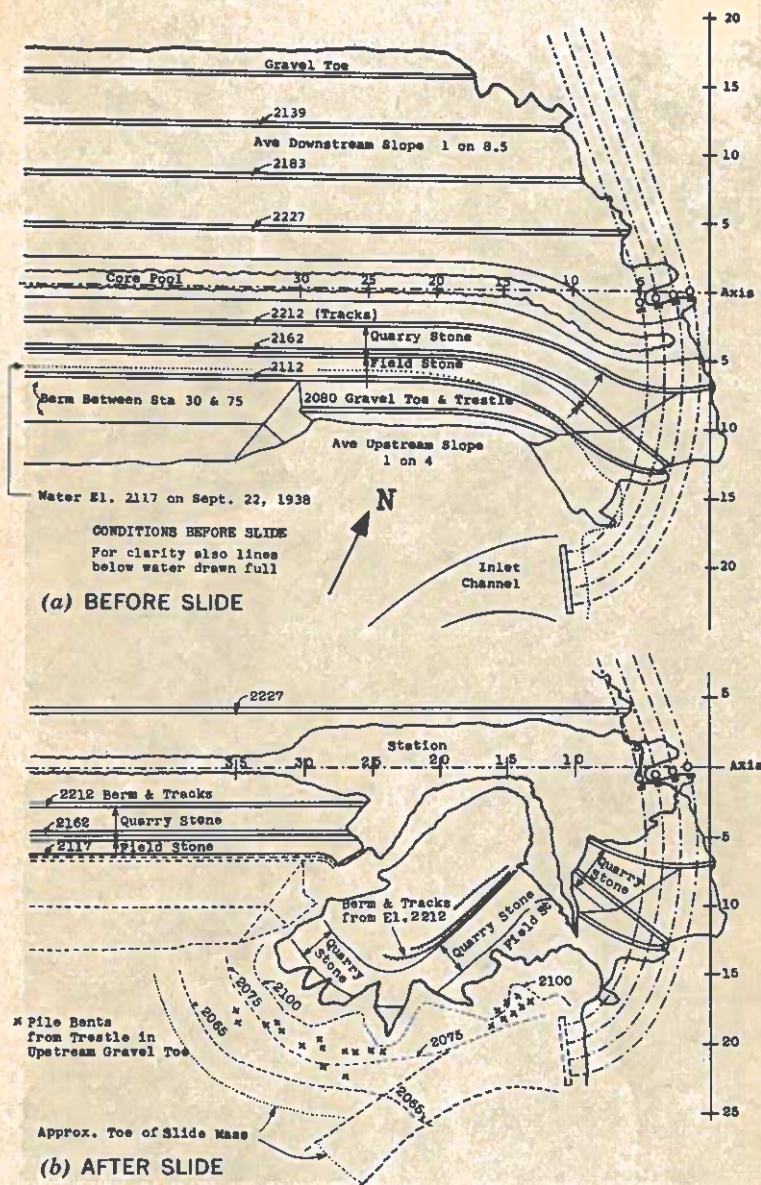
PLAN OF FORT PECK DAM SLIDE AREA
